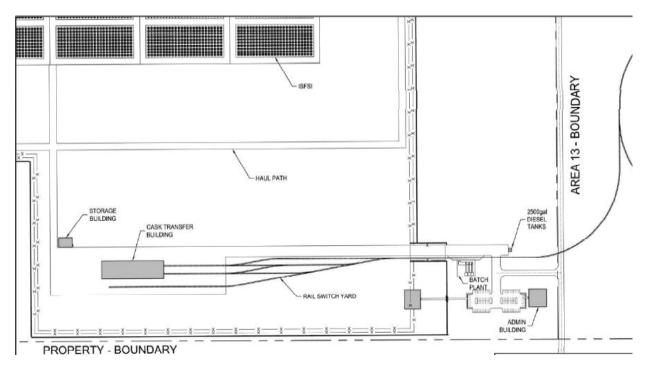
Proposed Project Building Layout (Source: Holtec, 2020a)
